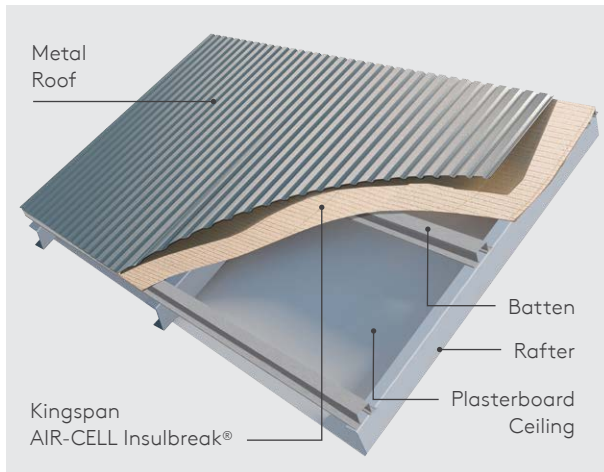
Kingspan AIR-CELL Insulbreak® in a metal roof with a raked ceiling.
